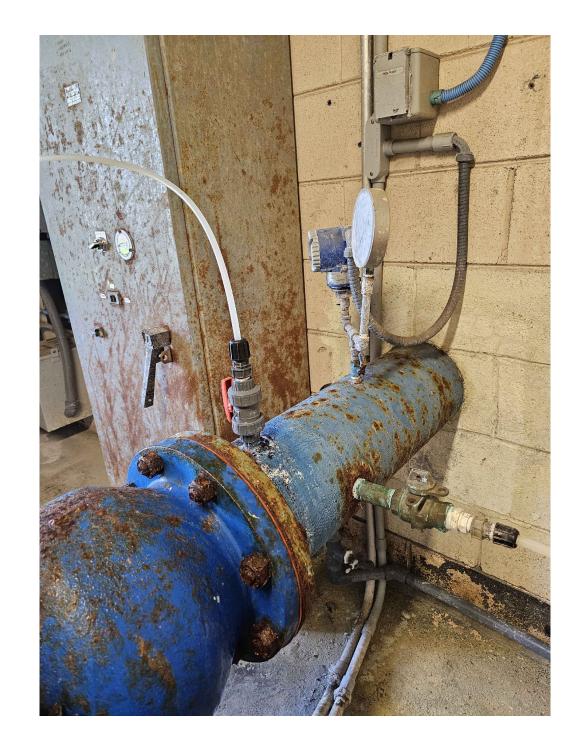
LOOKING SOUTH TOWARD WELL DISCHARGE
